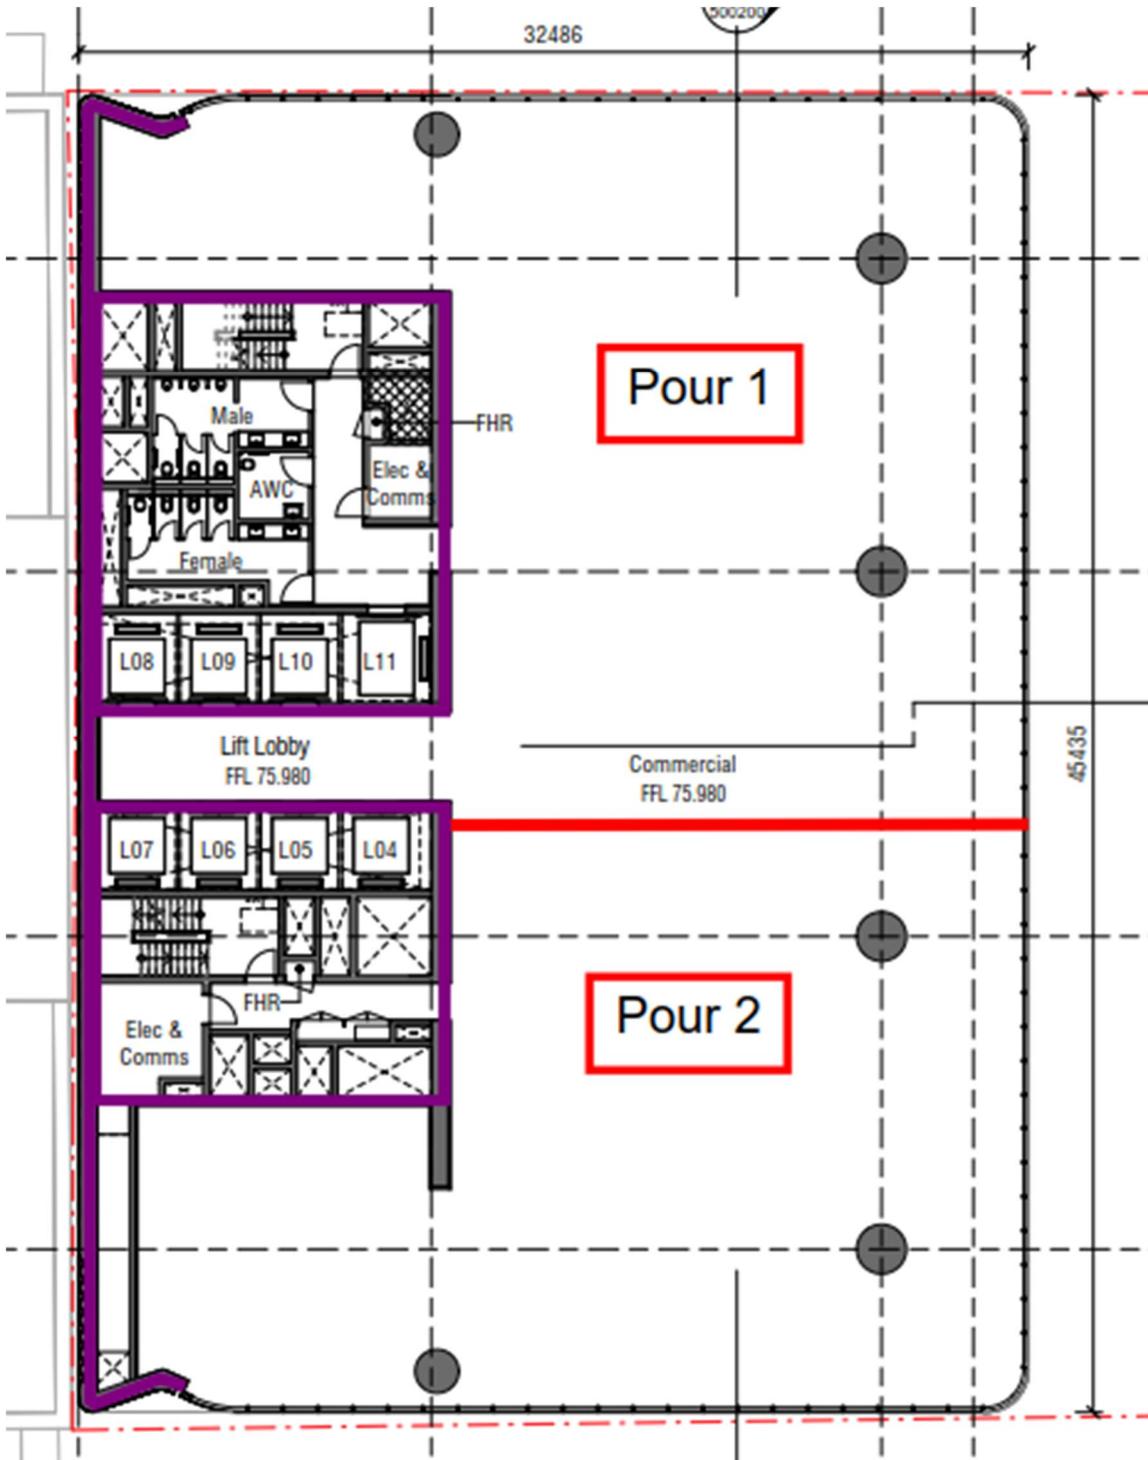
South Tower – High-Rise Tower Structure (IMAGE UNDER REVIEW)
